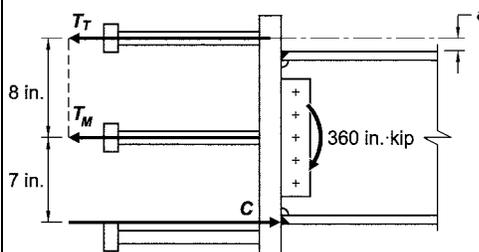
Example 12: Beam support consisting of embedded plate with welded studs.
